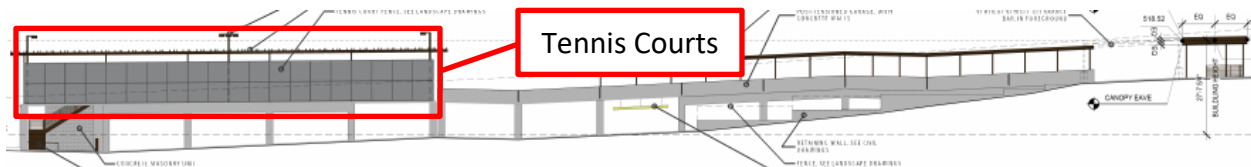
Parking Garage West Elevation. Annotations provided by Staff. Source: ISD Application Materials (Attachment 98 –Architectural Plans & Building Elevations).
